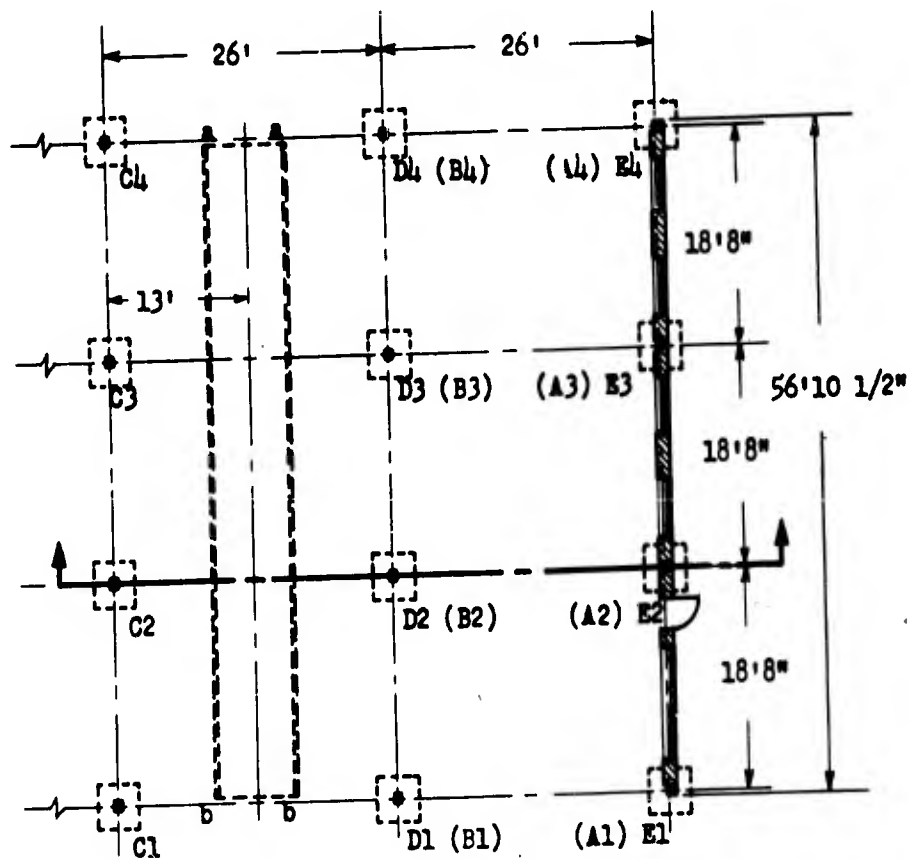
Column Location and Footing Plan of Building 3.3.4 (Overall Dimensions: 56'10 1/2" x 106')
